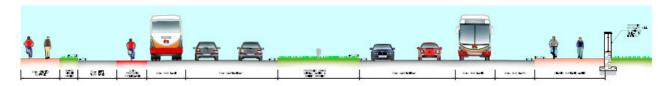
Proposed N11 Road Cross Section South of Junction Q
